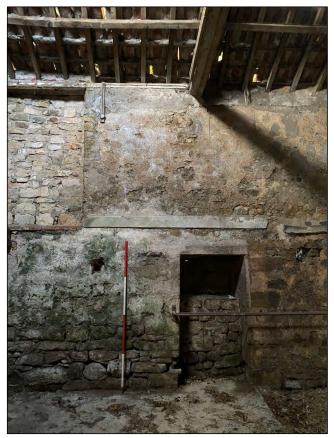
View looking north at blocked door & window in the north wall (internal) of the Central Building.
